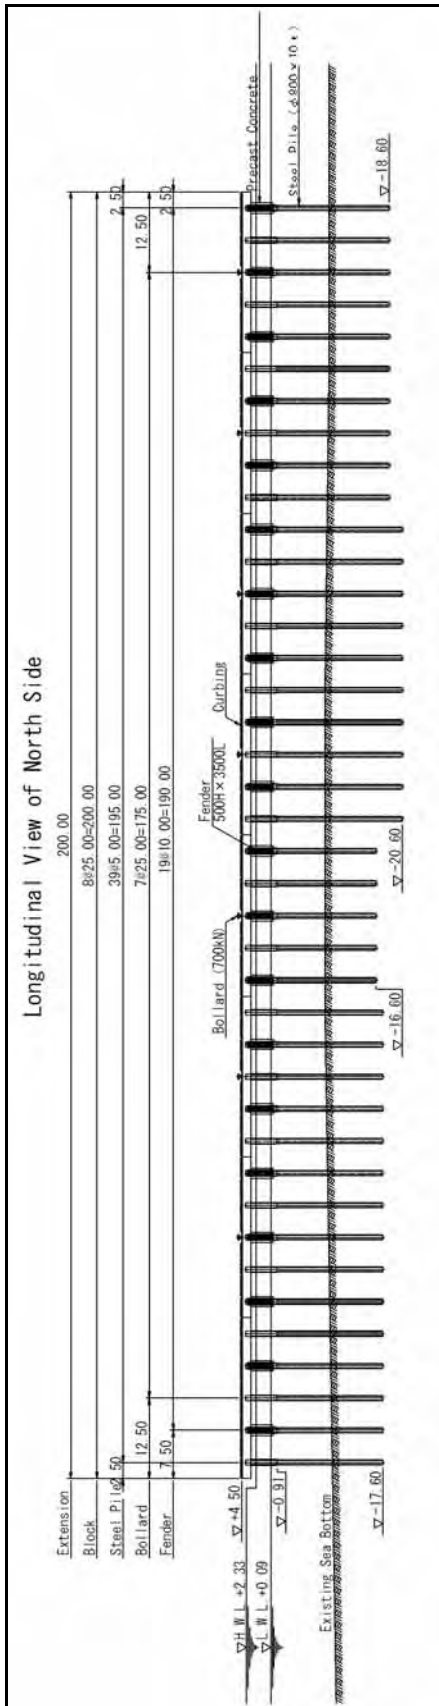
Longitudinal View of North Side of Pier
